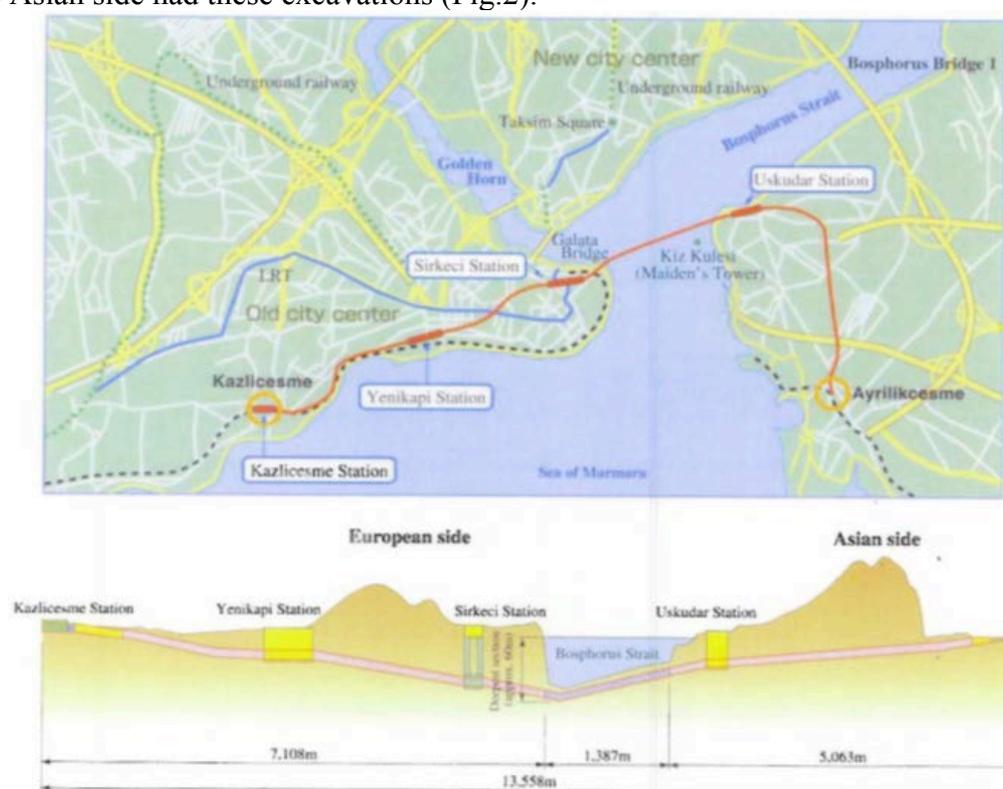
The Marmaray Rail Tube Tunnel Plan and Section (Heidenhain, 2010: 1)
